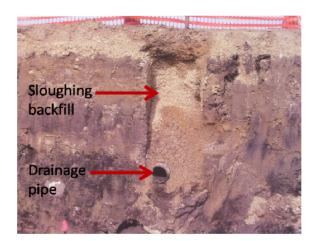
Existing granular backfill over a drainage pipe begins to slough away
